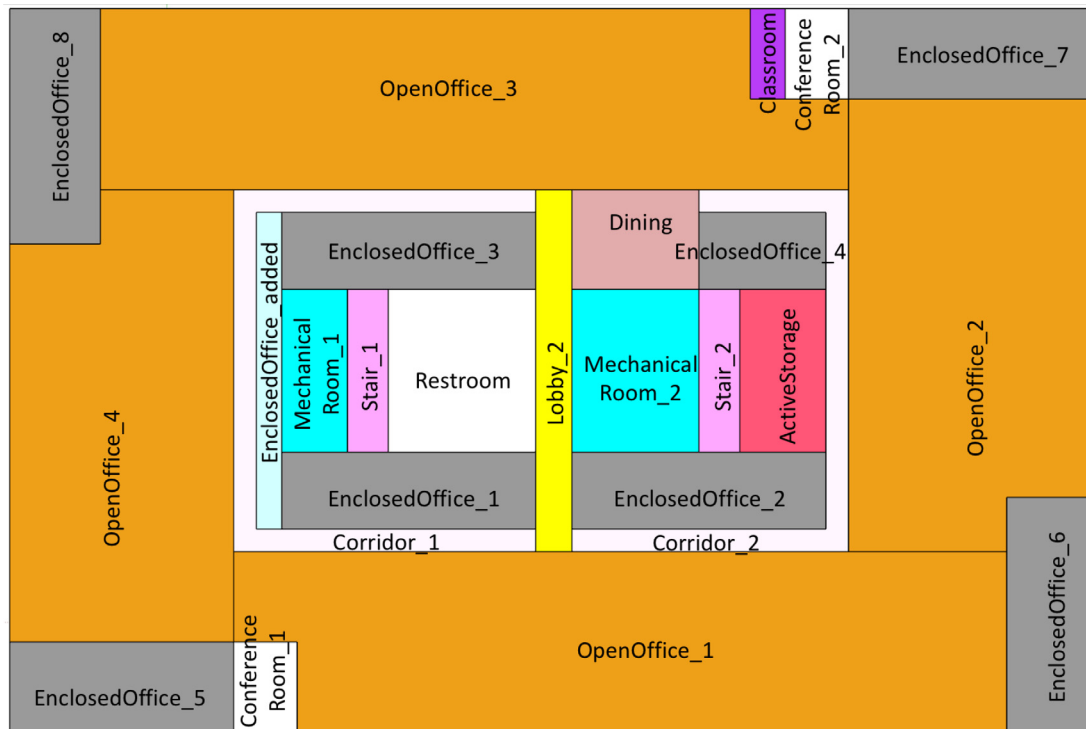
Example floor plan showing thermal zones in the detailed zoning version of the commercial building prototype model used for the analysis.
